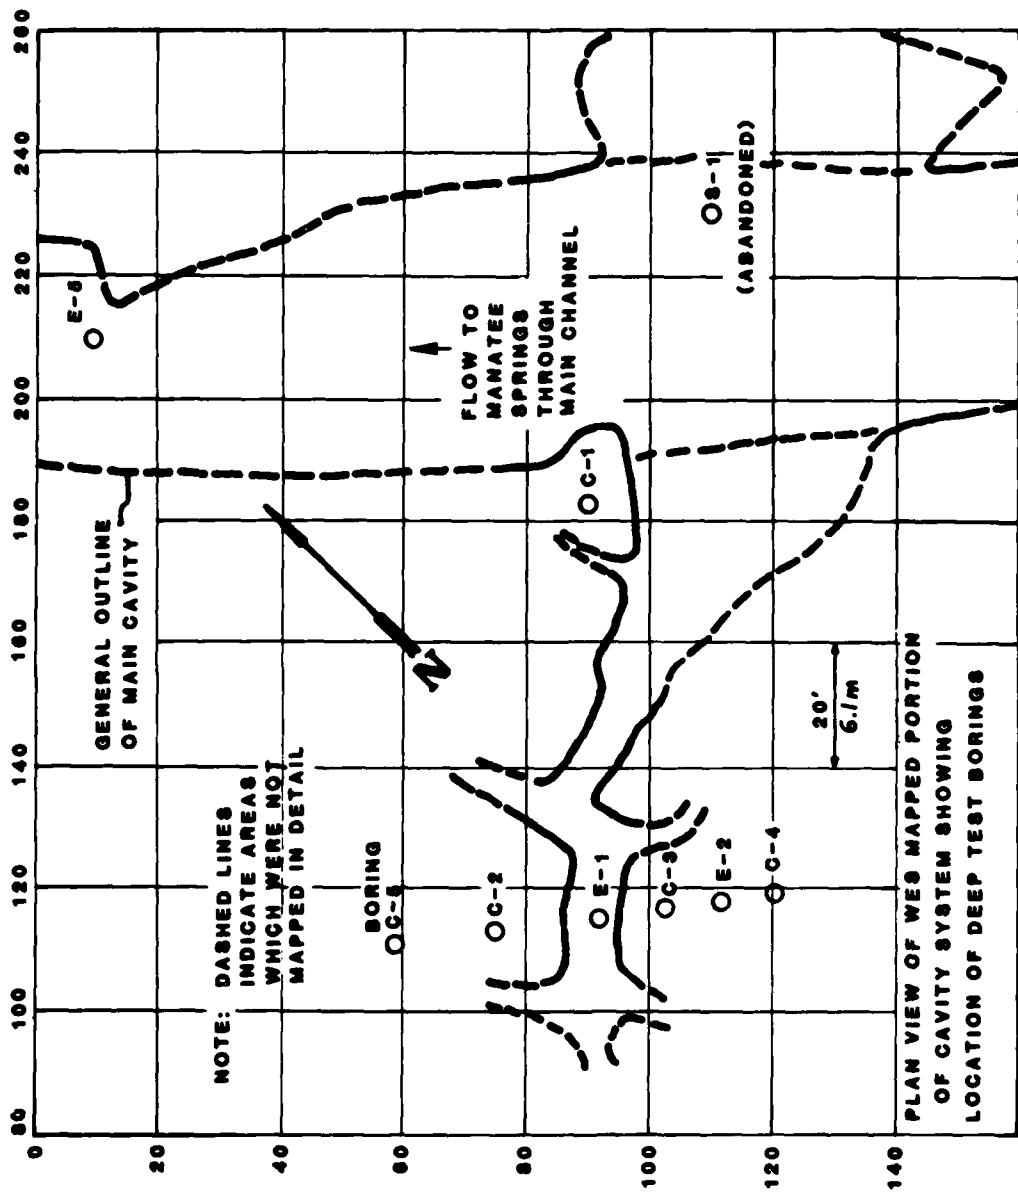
Plan view of the Manatee Springs test site showing the cavity system and boring locations
